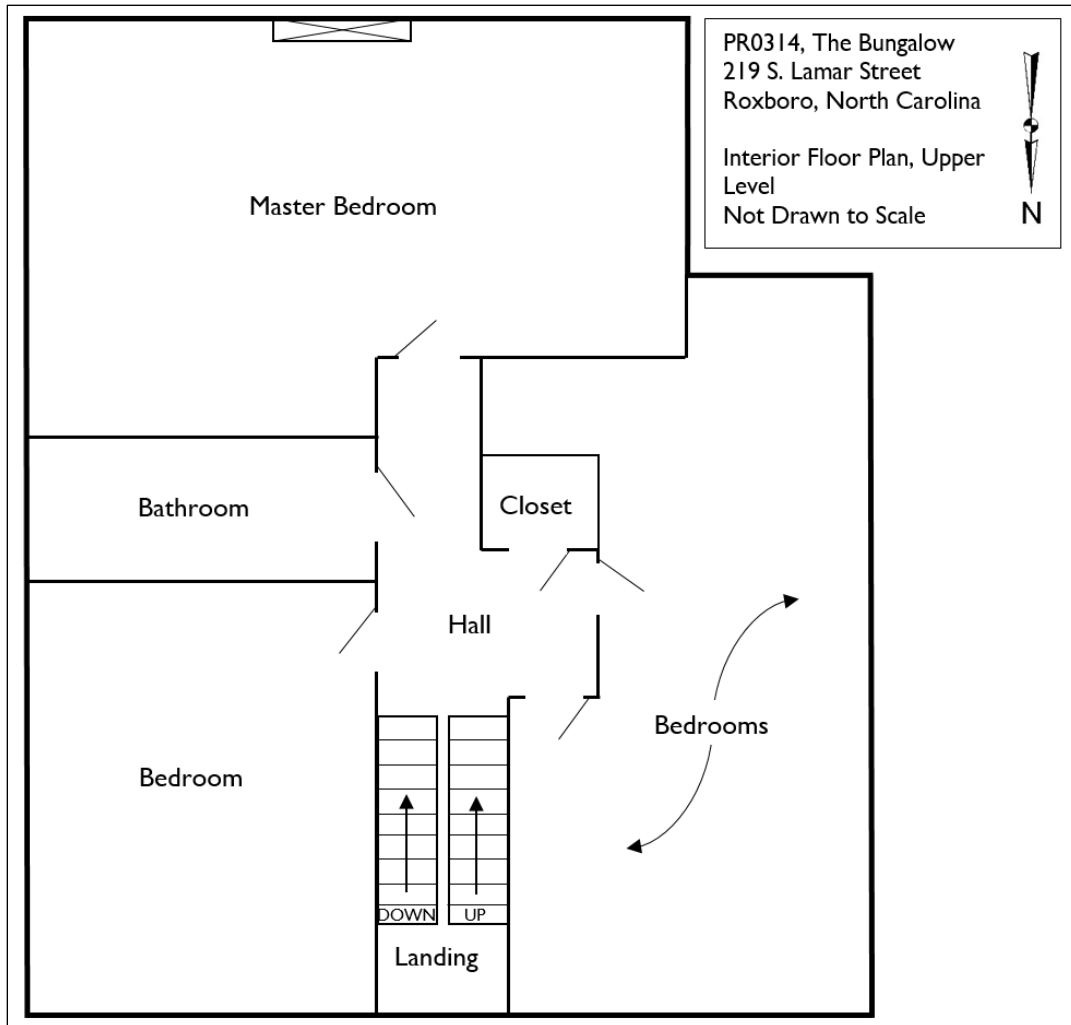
Upper Level Floor Plan of The Bungalow (PR0314).
